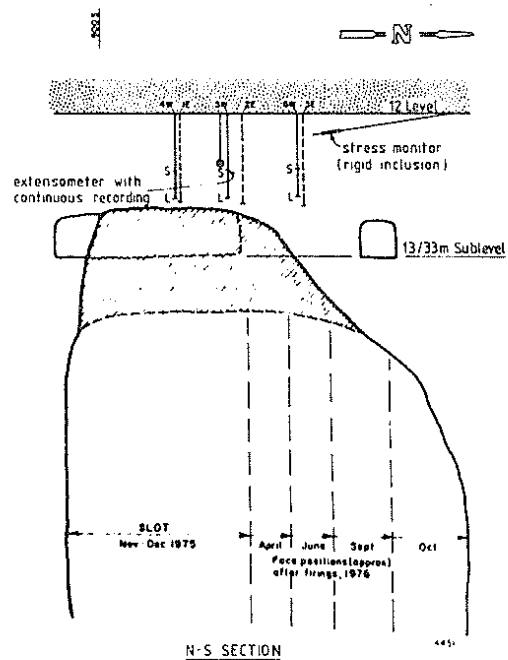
N-S section of Panel 10 crown pillar showing overbreak and monitoring installations.
